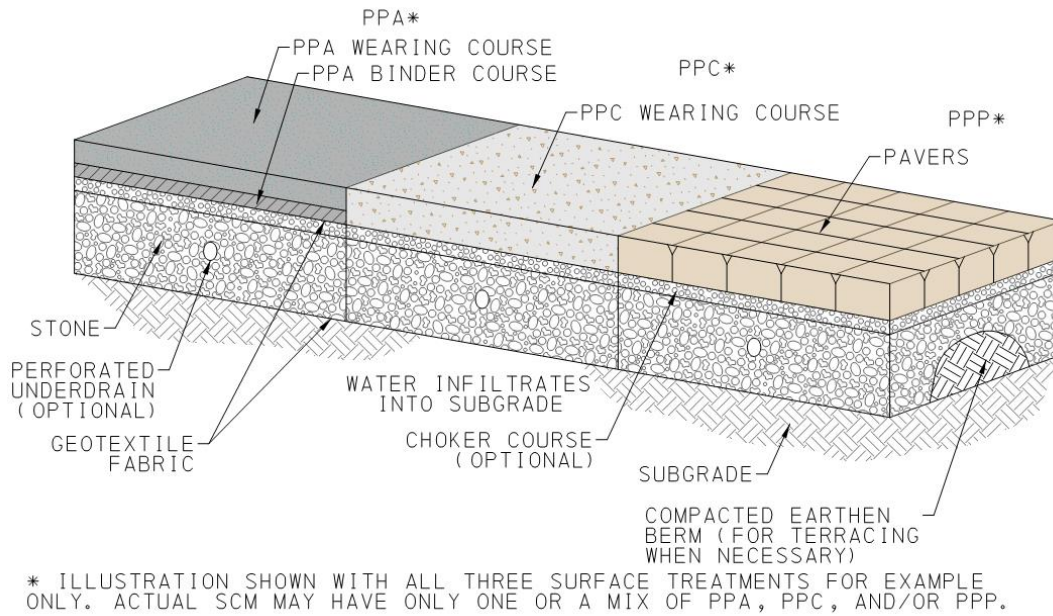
Pervious Pavement- Asphalt, Concrete and Pavers - Common Elements
